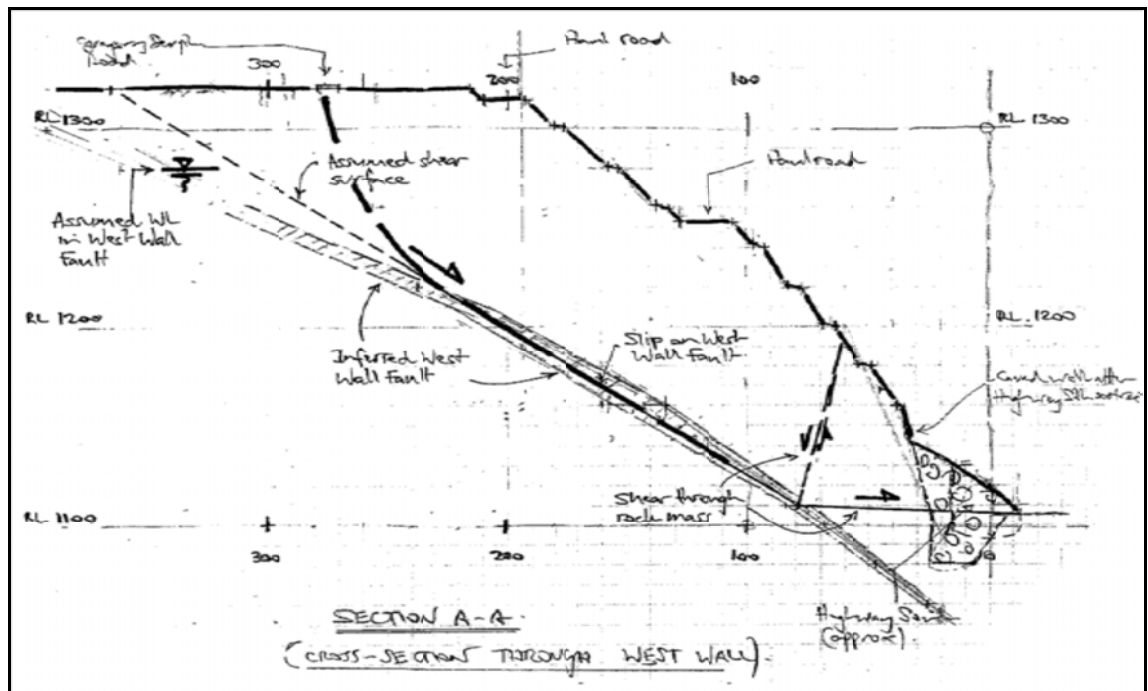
Cross section of predicted failure mechanism through the West Wall Fault
